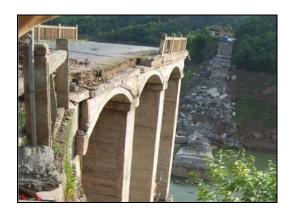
Jing Tian Ba Bridge, a two-span box arch bridge, collapsed
